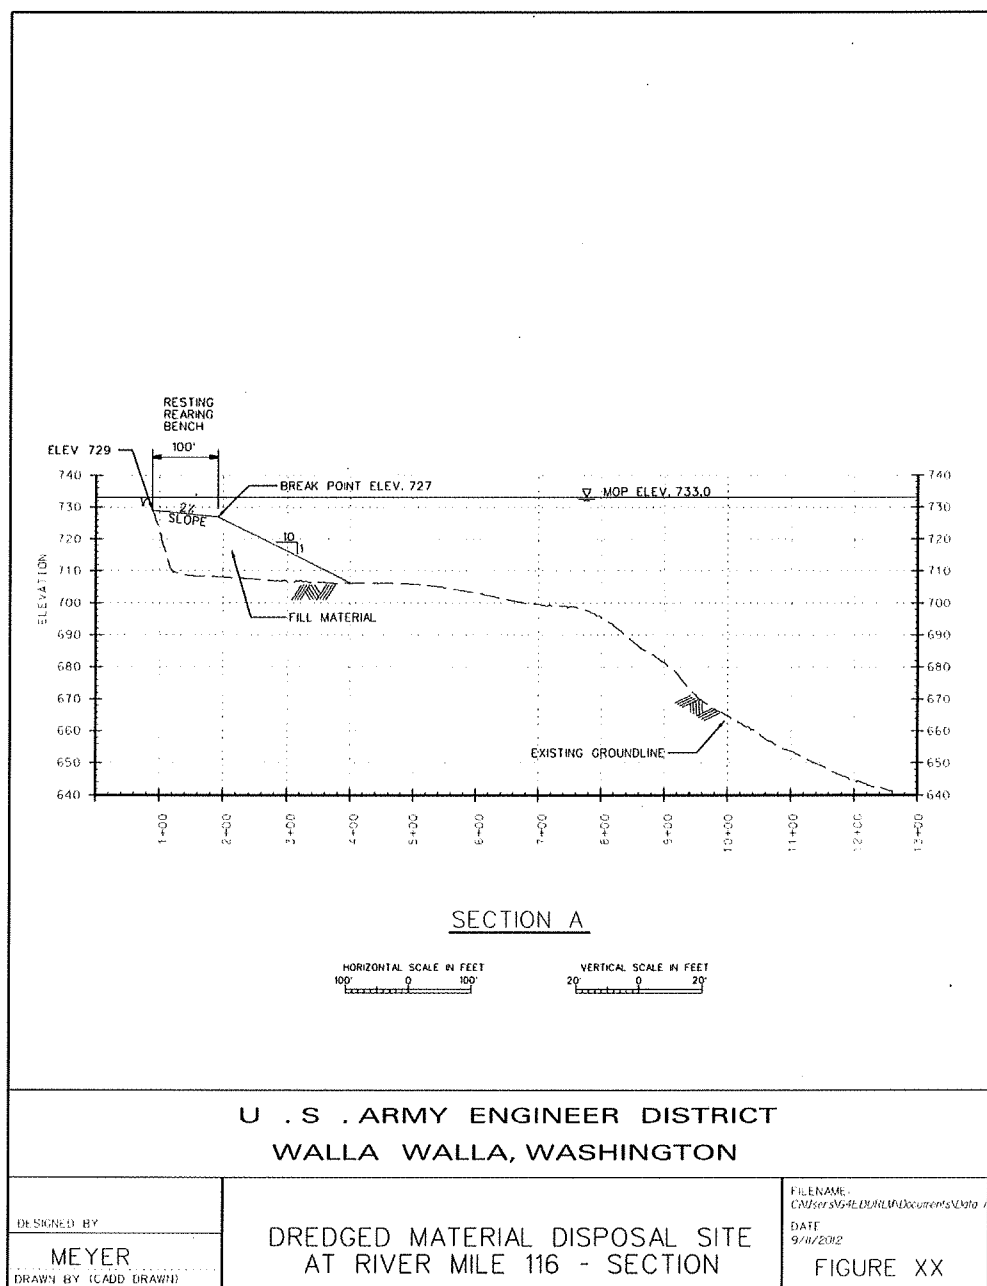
Cross-section of disposal site after proposed placement of dredged material in 2013/2014.
